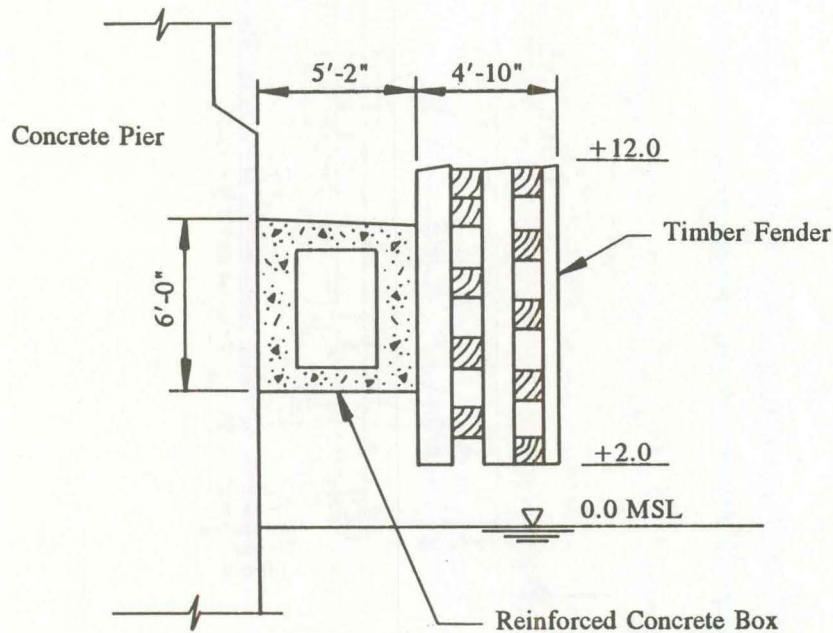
Crushable Concrete Box Fender on the Francis Scott Key Bridge Main Piers, Baltimore, Maryland.
